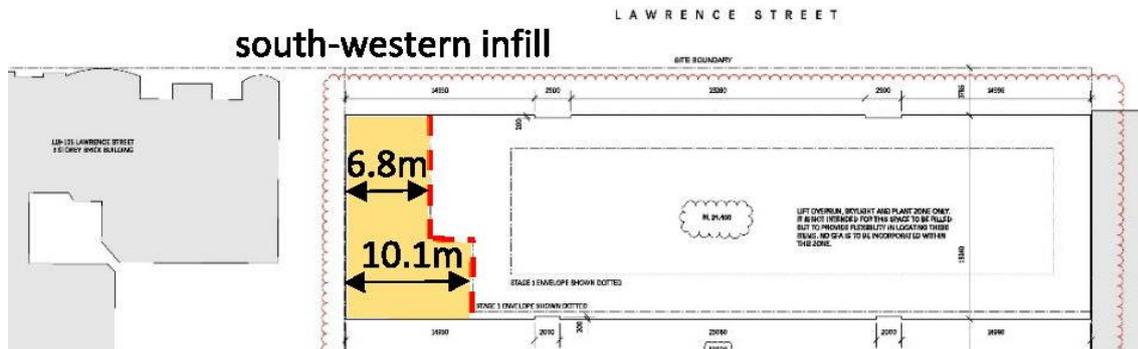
Ground floor amended envelope with approved concept envelope (red) and required ADG building separation to adjoining property boundaries (blue). The diagram illustrates the change to the bays of Building A
